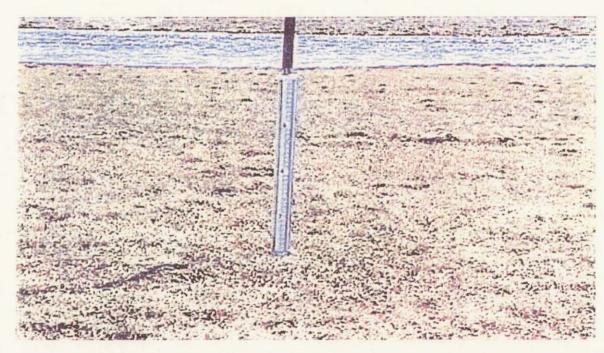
Looking southwest at the proposed pipeline crossing and staff gage (5/29/98), note change in water surface elevation between this picture and previous picture.
